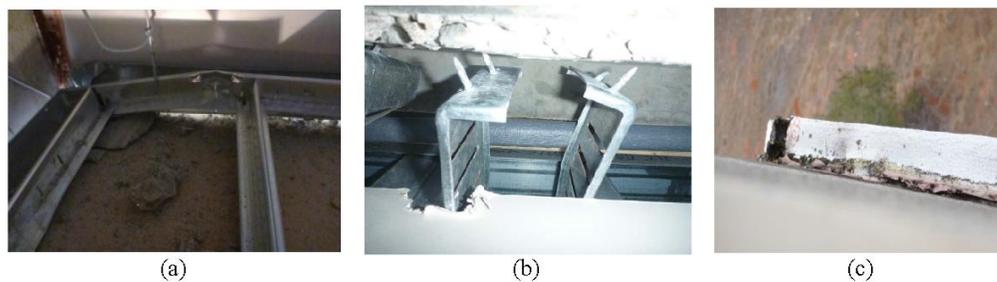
Issues affecting compartment integrity (a) Gap formed at North balloon framing and ceiling joint of Floor 3; (b) detached balloon framing connection clips; (c) gaps developed at the EIFS façade.
